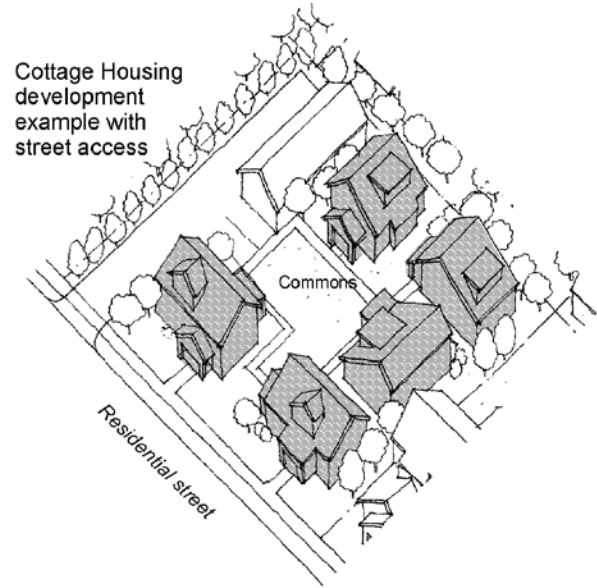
Cottage housing development example. Note the configuration of units surrounding a common open space, with vehicular access and garages off the side.
